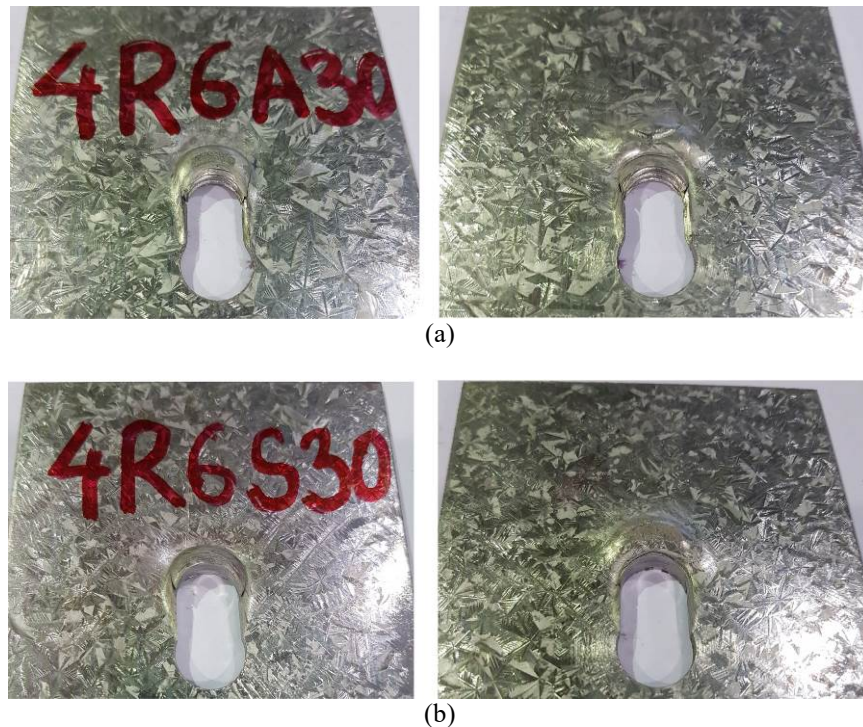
Effect of bolt threads: (a) thread specimen; (b) shank specimen
